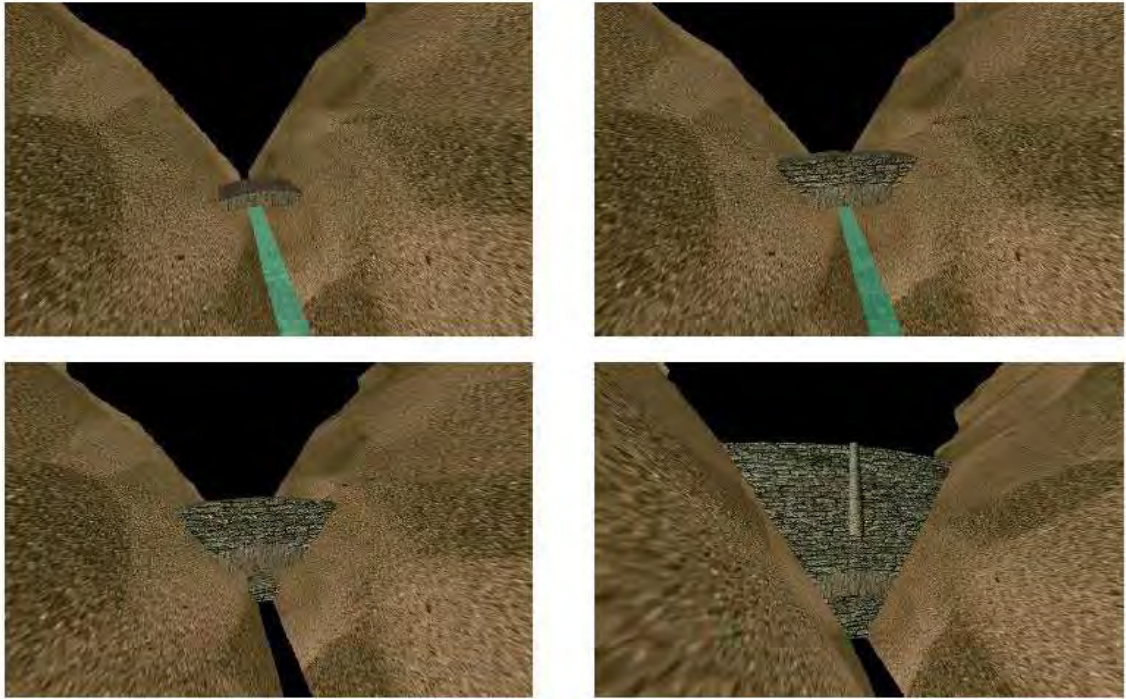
Construction of the dam on a brick arch to manage floods during construction
